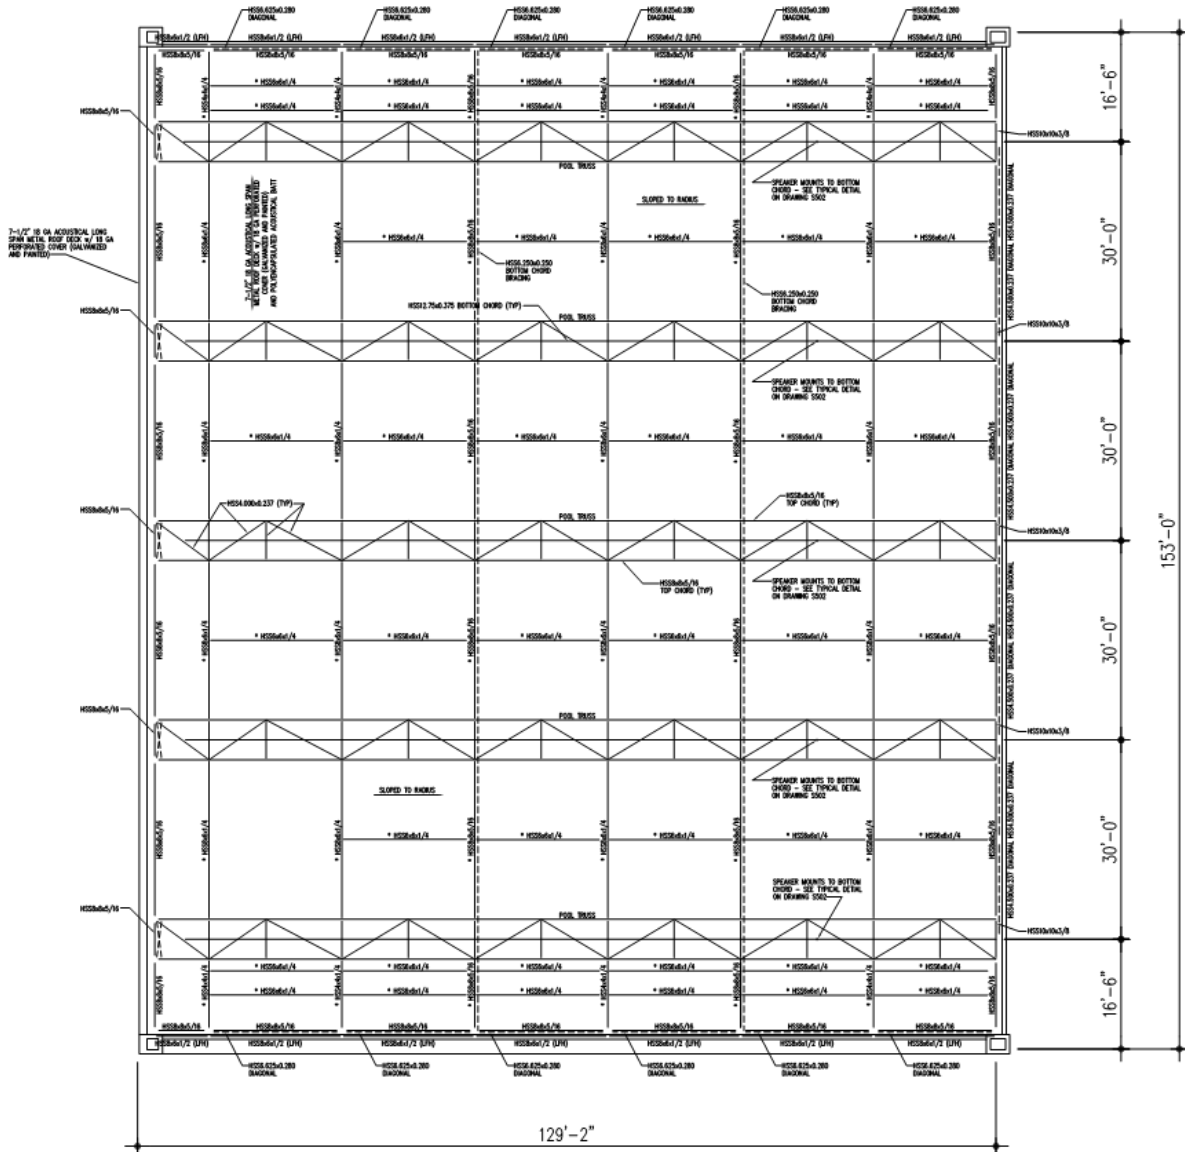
Roof Framing Plan (including the five large trusses above the pool area spaced 30’-0” on center and additional framing)
